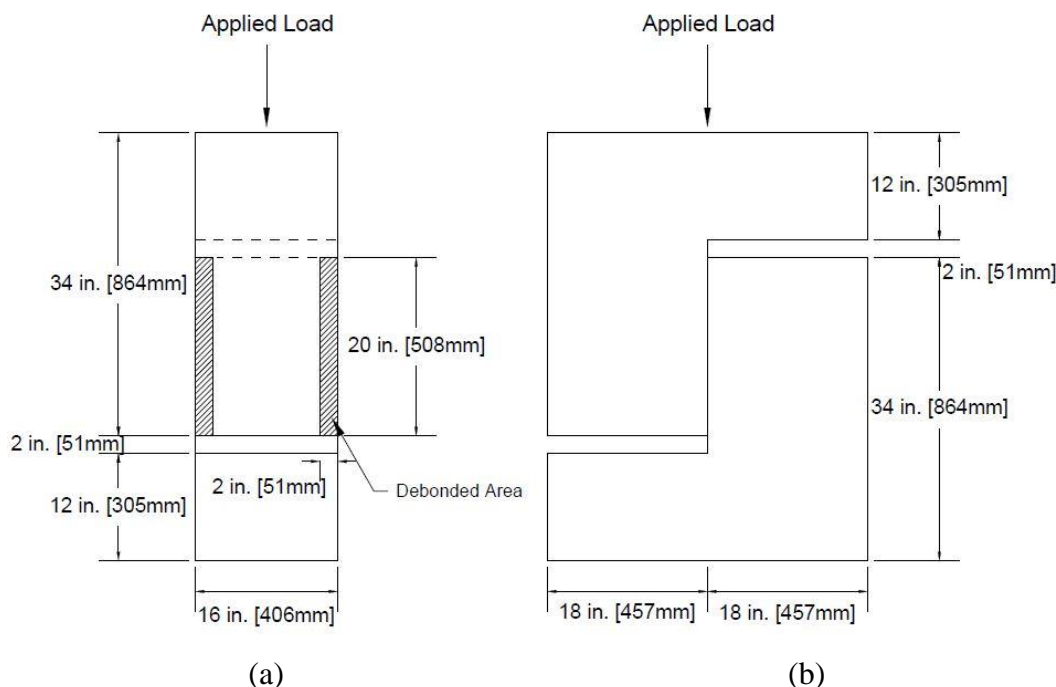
(a) Front view elevation, (b) side view elevation. “Debonded area is shaded”.
